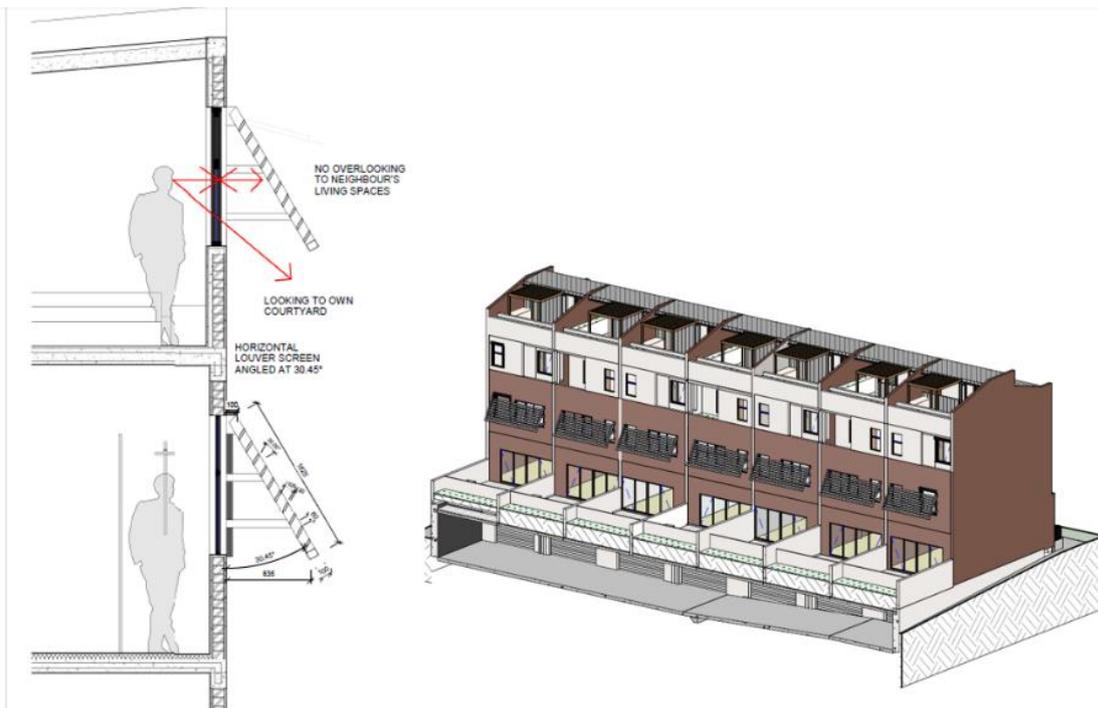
The proposed privacy treatment to bedroom windows facing the internal courtyards
